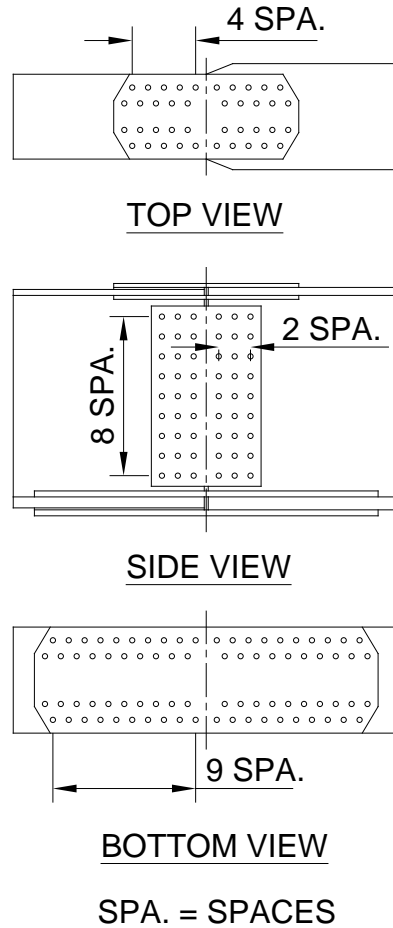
Drawing of Route 340 Bridge Bolted Splice
